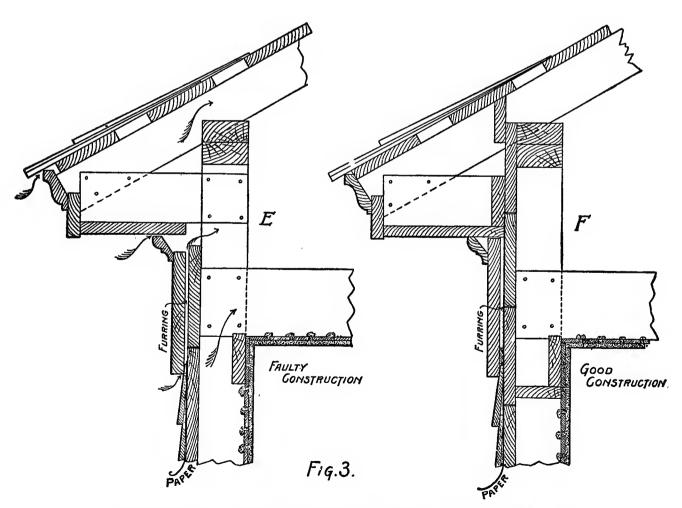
A-CORNICE CONSTRUCTION, GOOD AND BAD
